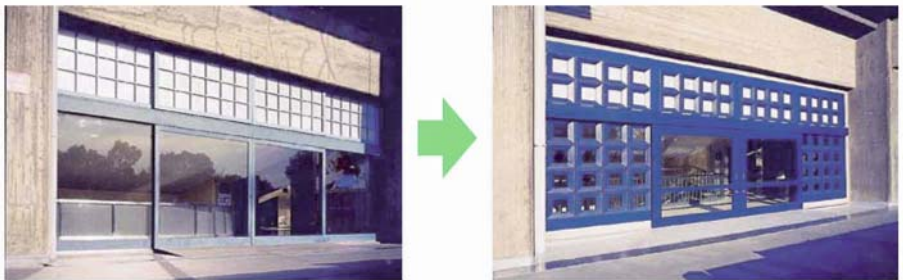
A strengthening element to match original design (Fujimura, M., et al, 2001)
